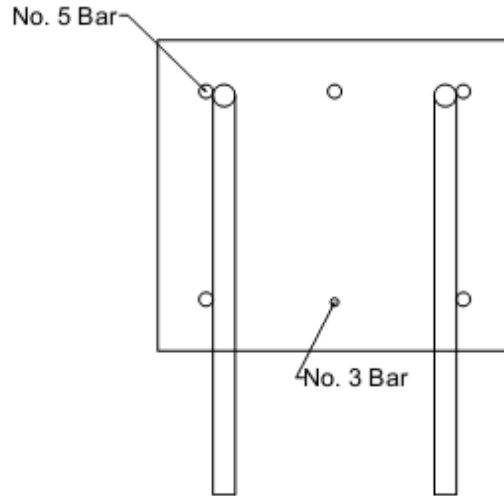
Longitudinal column reinforcement-5 No. 5 bars + 1 No. 3 bar. Transverse reinforcement not shown.
